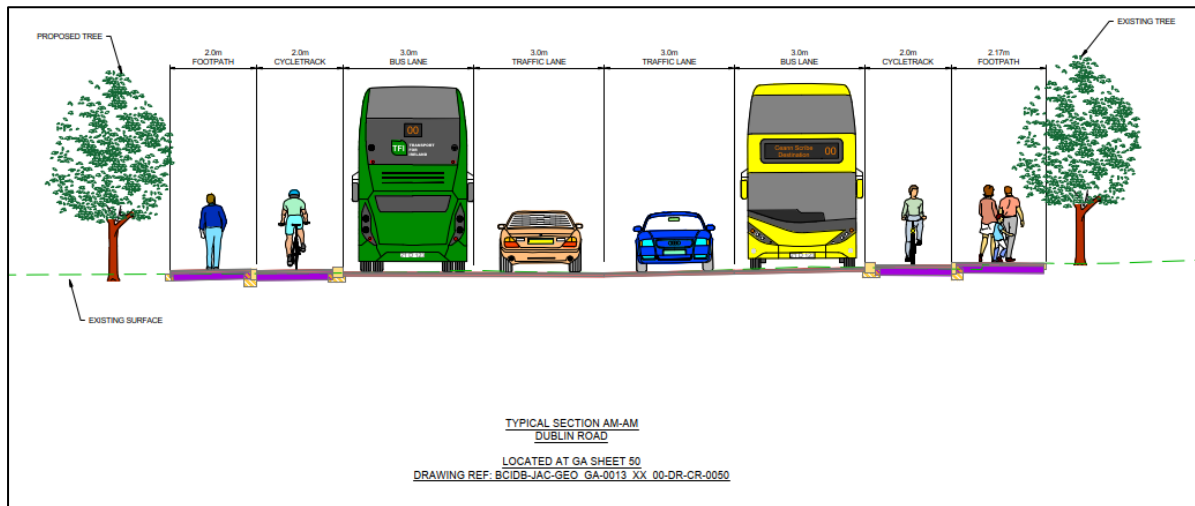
Extract from Typical Cross-section at Dublin Road, Woodbrook Side Lodge (Sheet 22)
